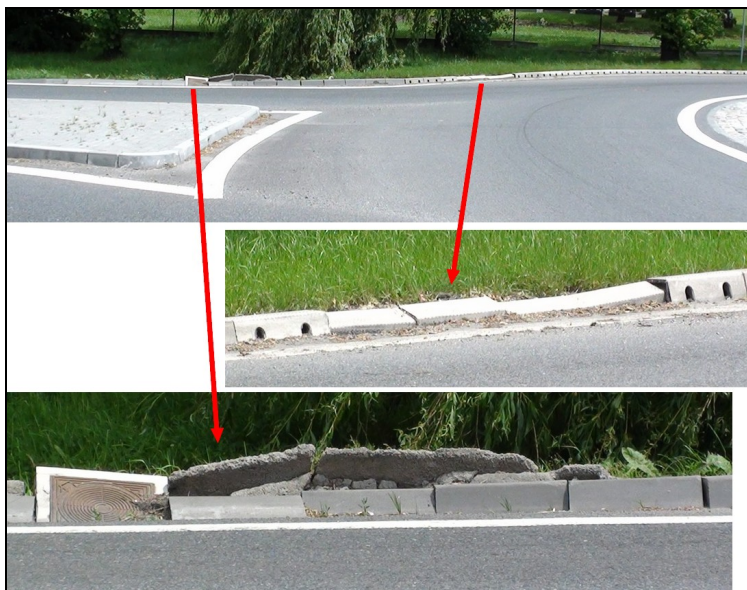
Detailed views of damaged curb on the exit from the roundabout Masarykova – parking Tesco in Valašské Meziříčí
